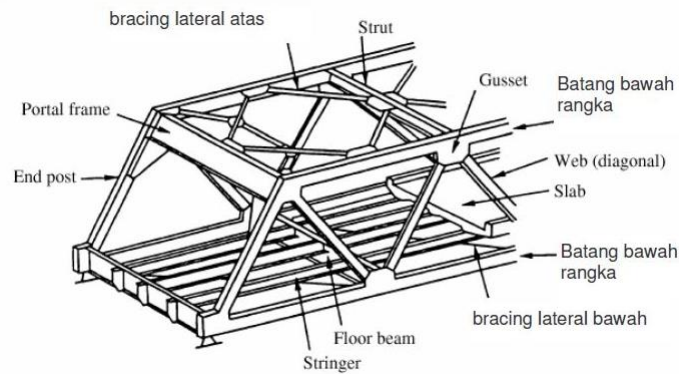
Component of truss bridge (Source: Chen dan Duan, 1999)
